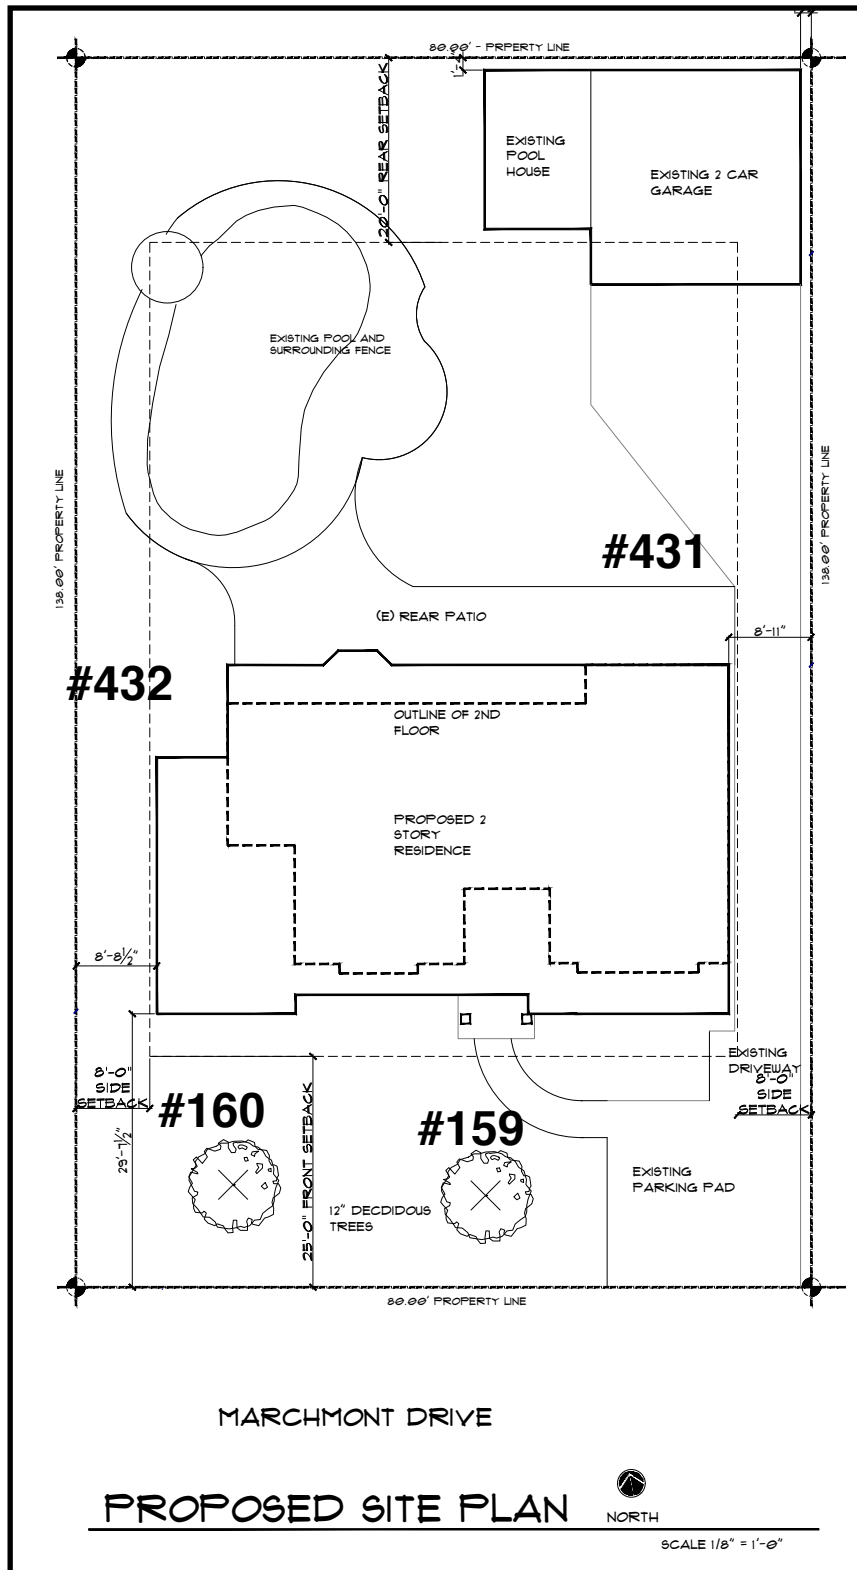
TREE LOCATIONS AND PROPOSED SITE PLAN
